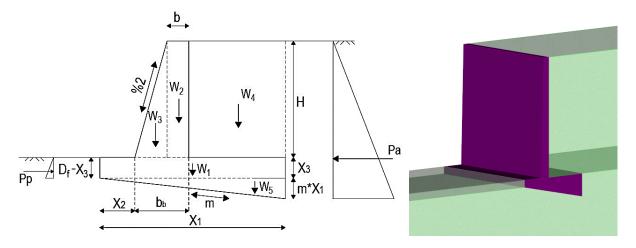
Inclined base cantilever retaining wall-GEO5 wall design
